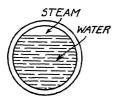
Section through horizontal pipe, the Lower part of which is filled with water and the upper part left open for flow of steam
